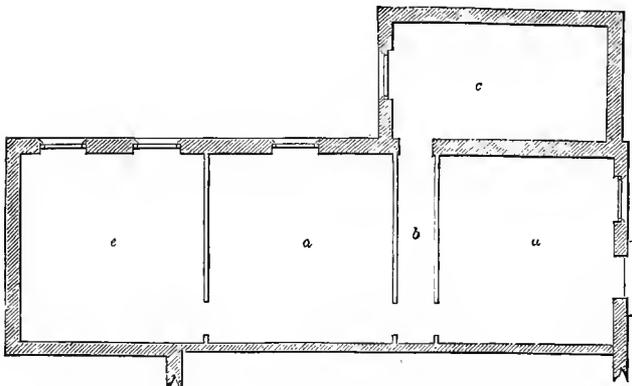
Alternative arrangement of part of chamber-floor story.
